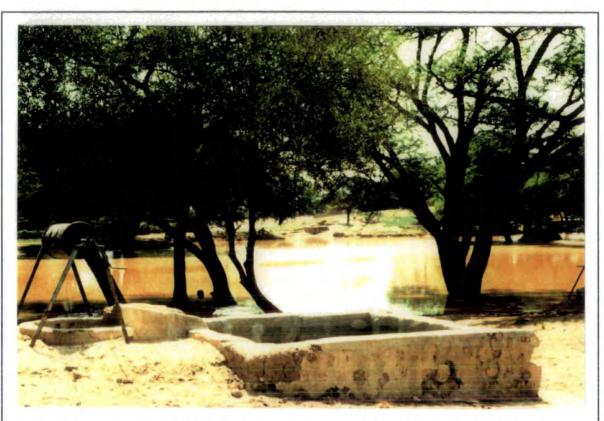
A well at En Nahud town located next to a tree-lined fula. A windlass system is installed and there are cement basins and chutes to aid distribution.
